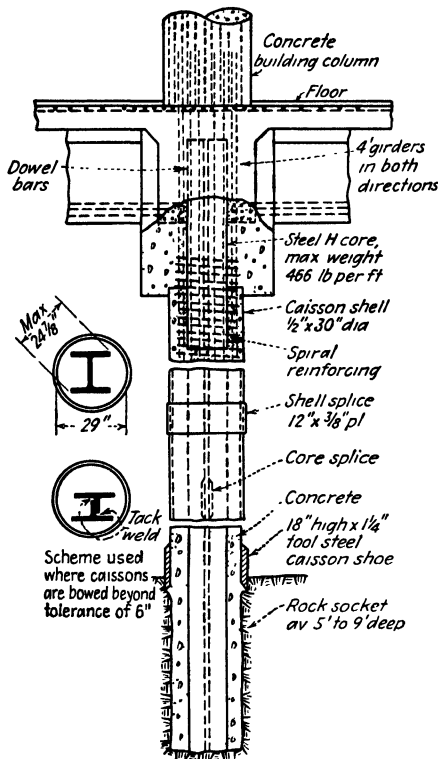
Drilled-in caisson for heavy column loads; connection to ground floor of building. (From Charles B. Spencer, Ref. 321, 1941.)
